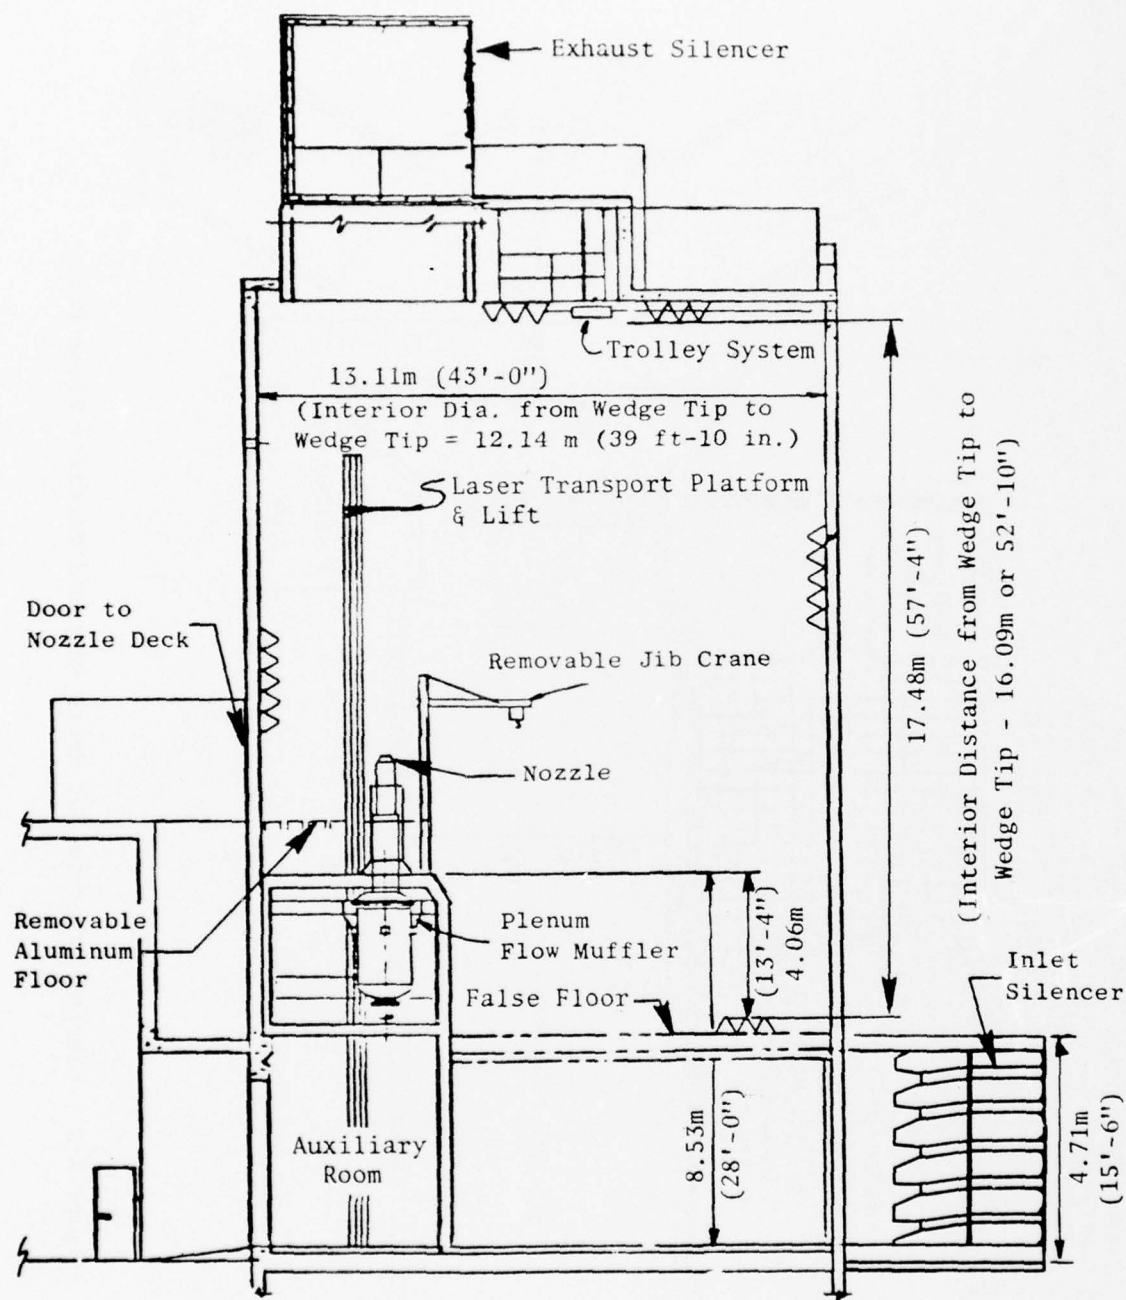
General Electric Jet Noise Anechoic Facility Cross Section.
